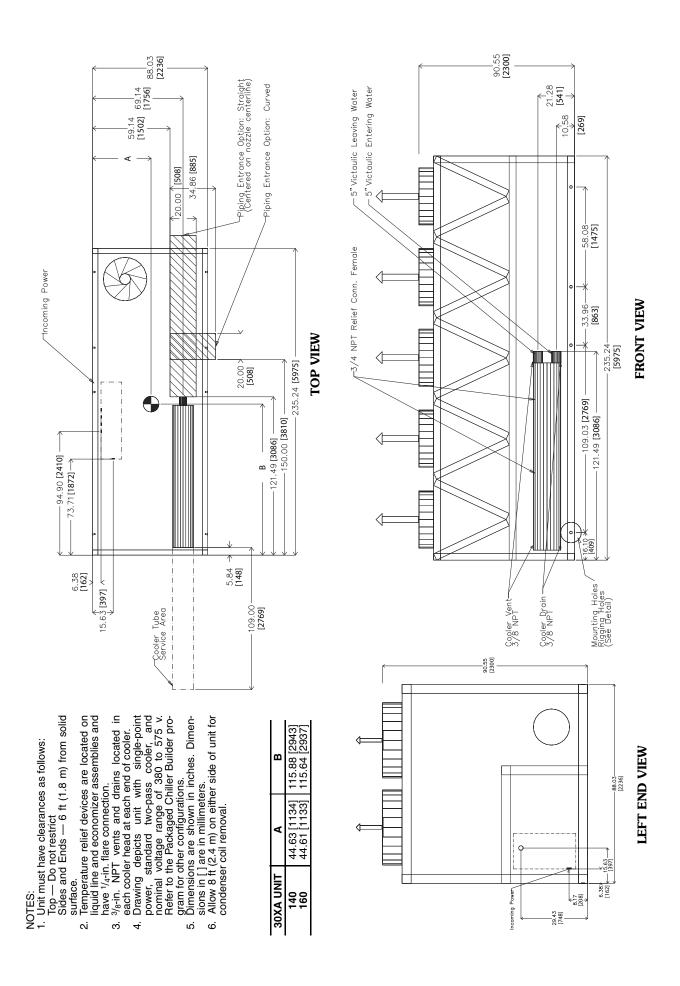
30XA140,160 Air-Cooled Liquid Chiller without Pump Dimensions
